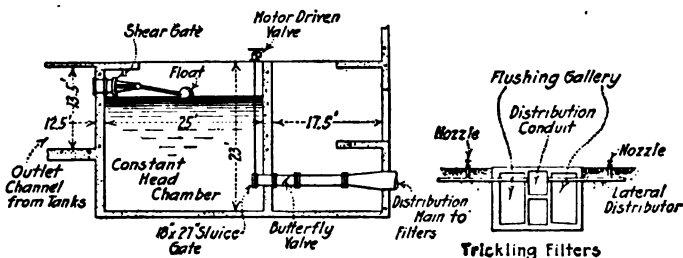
Sectional elevation of dosing apparatus, Baltimore.
